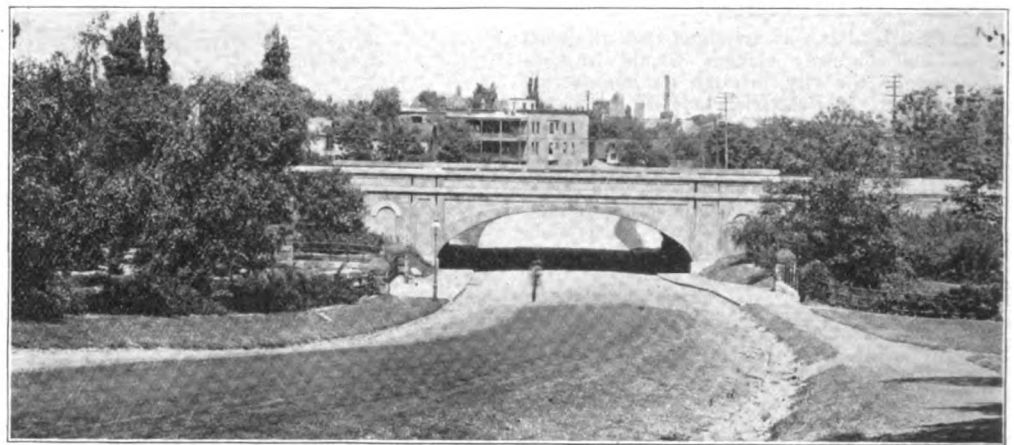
New East Boulevard Bridge, Cleveland— Combination of Arch and Plate Girders with False Parapet and Soffit.
